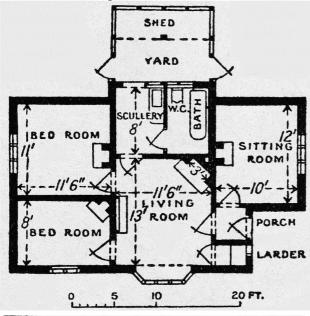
Bungalow at Renshurst, Kent, built of brick, roughcast, with tiled roof and genuine half-timber work in the gable. Above, plan. (Designed by T. Millwood Wilson)
